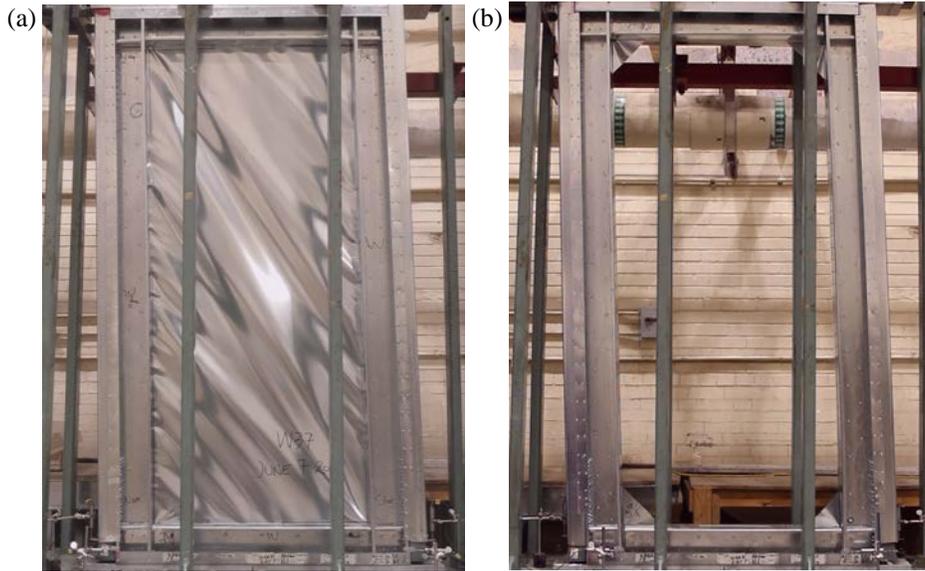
Tension field during testing : (a) Test specimen W35 (b) Test specimen W35F
